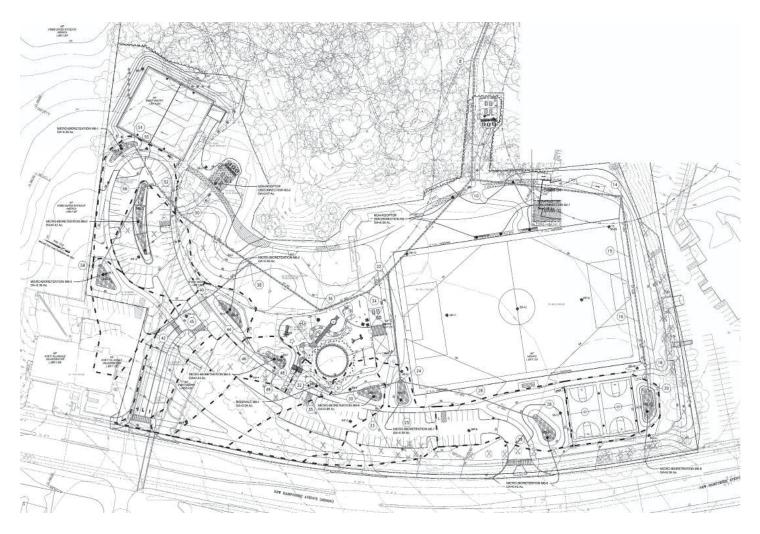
STORMWATER MANAGEMENT CONCEPT PLAN
